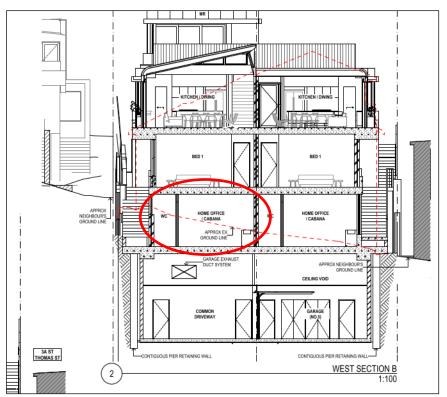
Extract of submitted architectural plans (West Section B – DA04.5). The area outlined in red demonstrates that a portion of the 'storage' should be counted as GFA.
